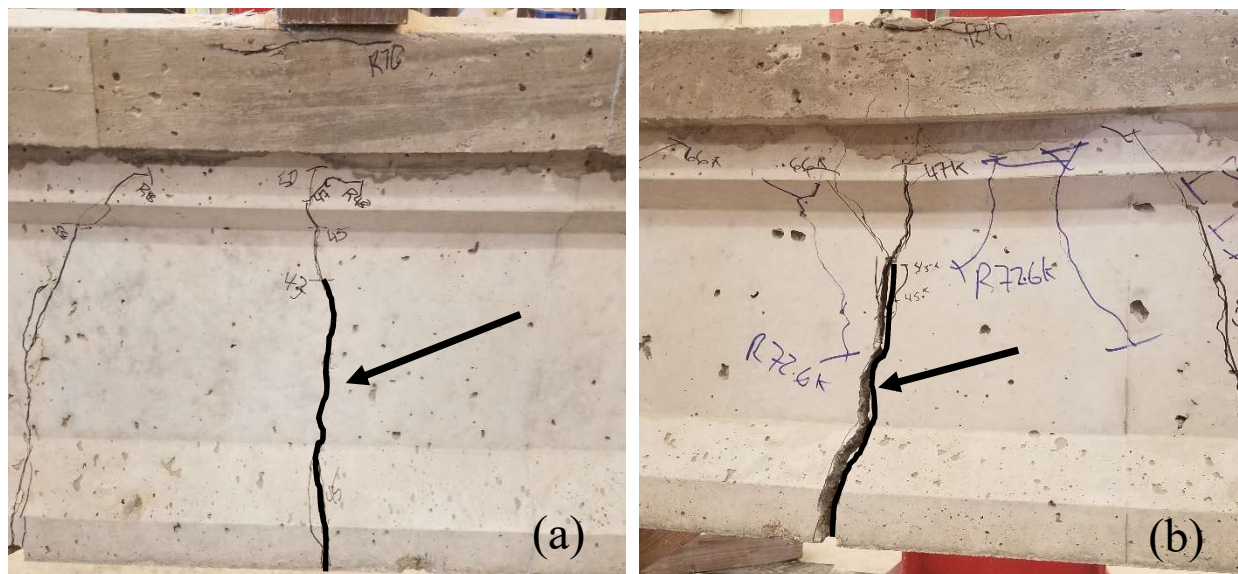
Initial flexural cracking under the load point on the NC1-N girder at 43 kips of load (a) and initial flexural cracking under the load point on the NC1-S girder at 45 kips of load (b). Arrows point to the dark lines that indicate the initial flexural cracks.
